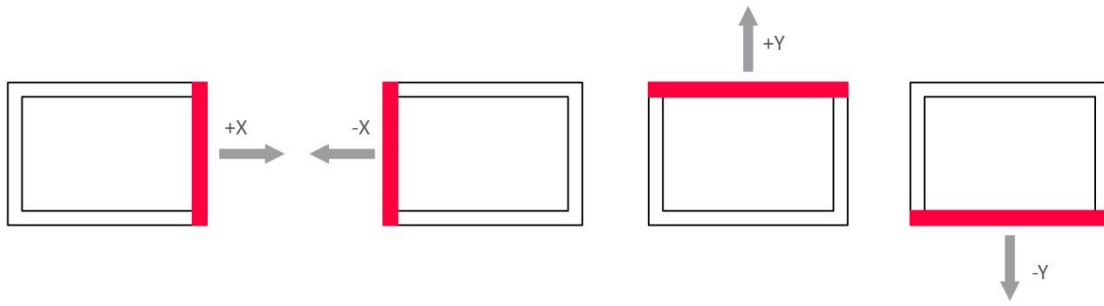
Wall to consider according to the loading direction evaluated (plan view)
